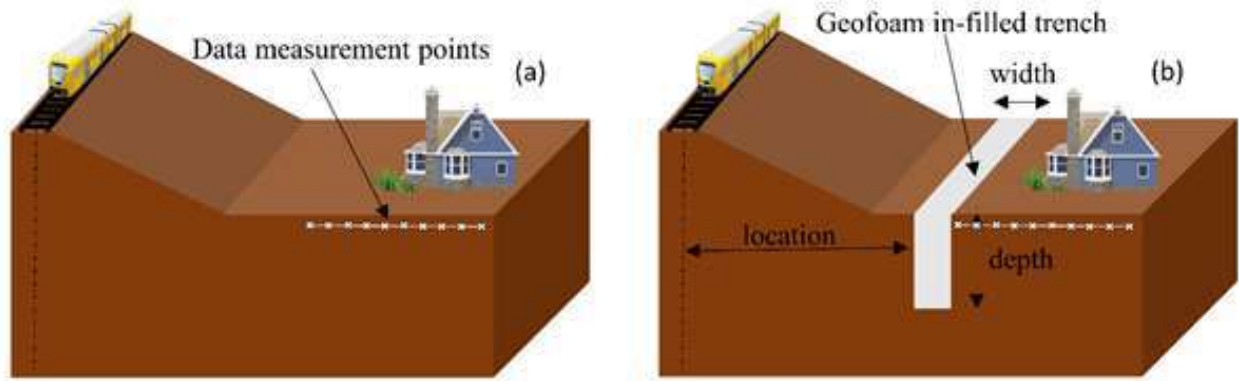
Railway embankment models (a) without trench (b) with EPS geofoam in-filled trench
